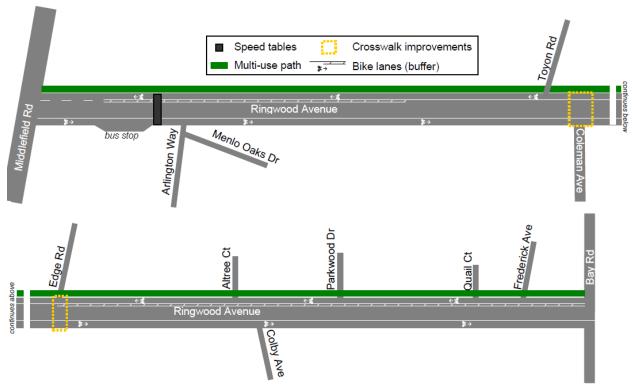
Ringwood Avenue Preferred Alternative Plan View Schematic Bike Lanes (Protected near Schools) with Off-street Pathway
